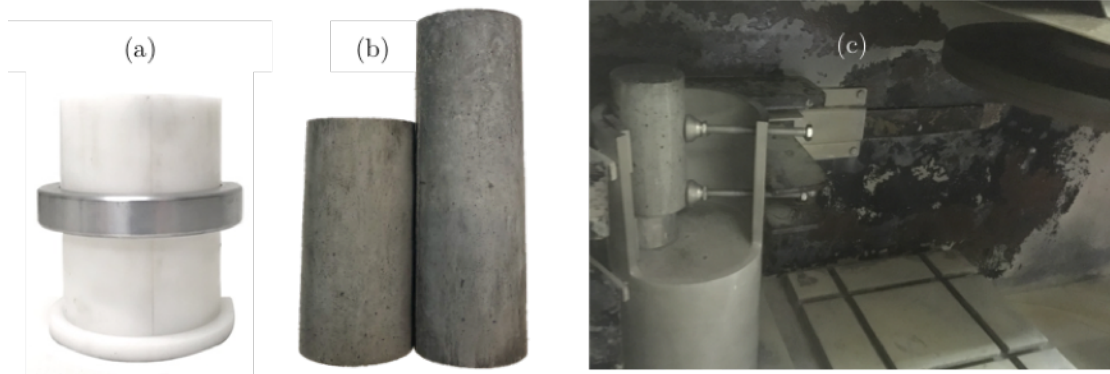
Specimen mold (a) ; Two different specimen sizes (b) ; Grinding machine (c)
